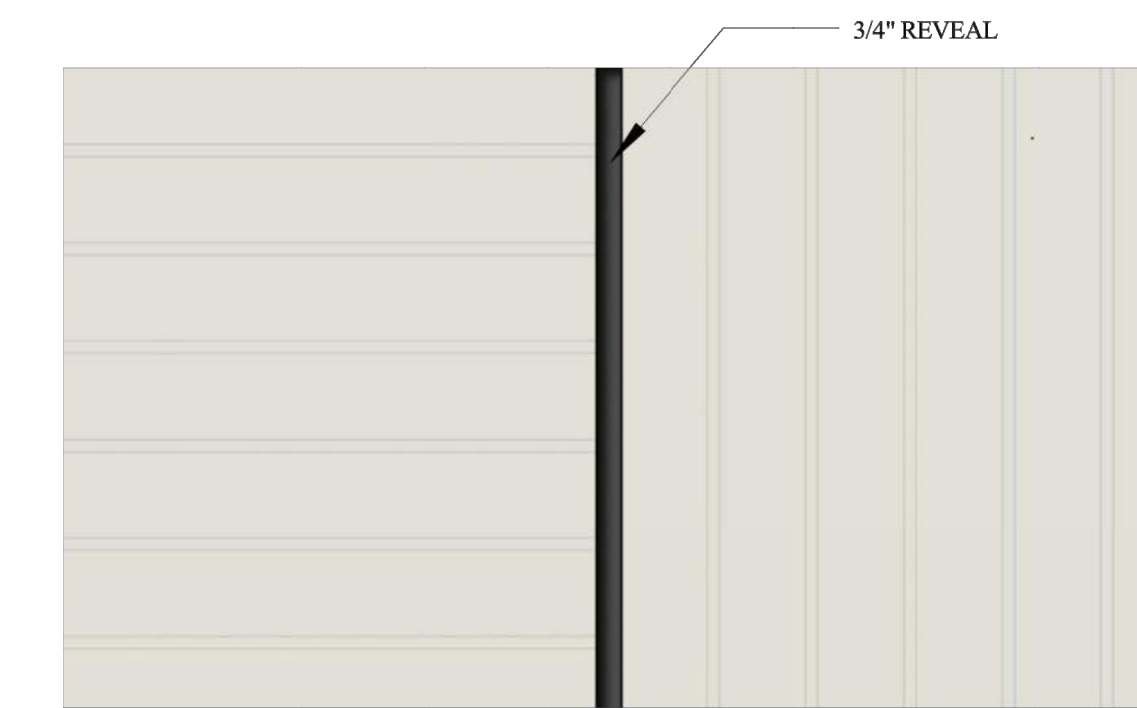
" V-GROOVE LONGBOARD ALUMINUM SIDING, PREPAINTED IN HORIZONTAL & VERTICAL PATTERNS, COLOR: BONE WHITE
